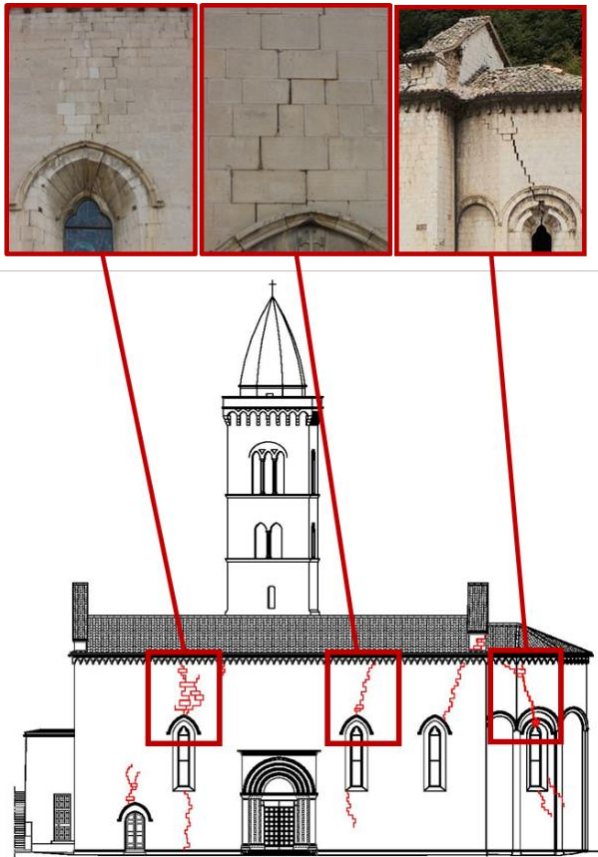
Crack pattern in the South-West façade and apse.
